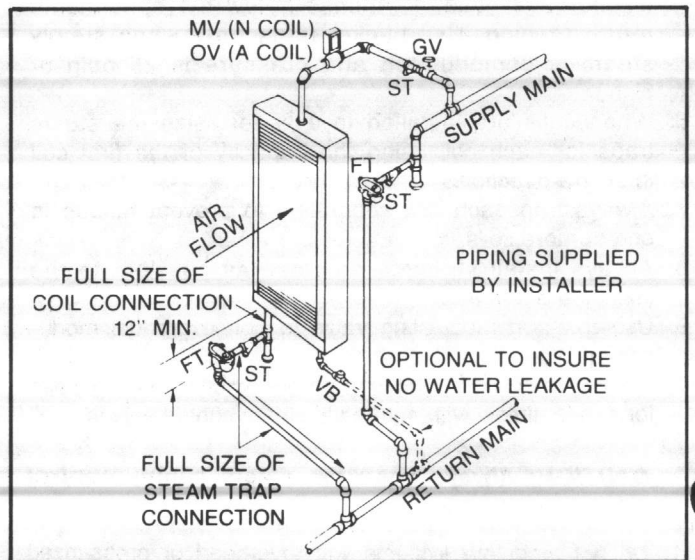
Typical Piping for Type A or N Steam Coils, Vertical Tubes for Horizontal Airflow
